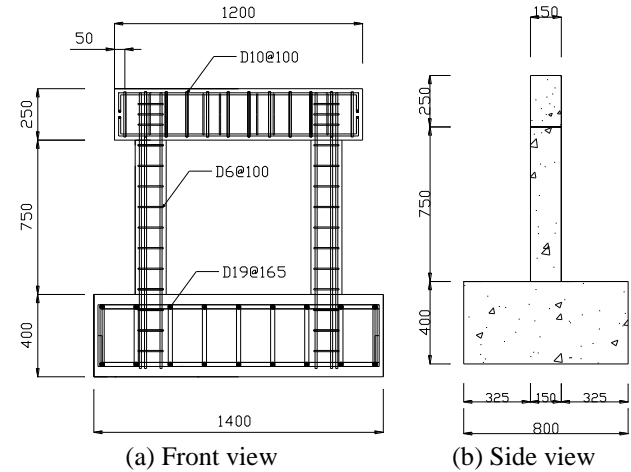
Dimensional and reinforcing details of C specimen (unit : mm)
